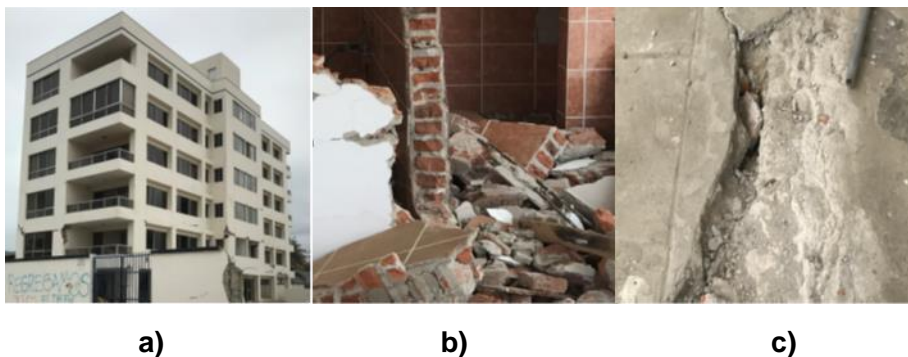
(a) The Delfín Building of 6 floors of reinforced concrete; (b) Detachment of covering in facade; (c) Severe damage in internal masonry.
